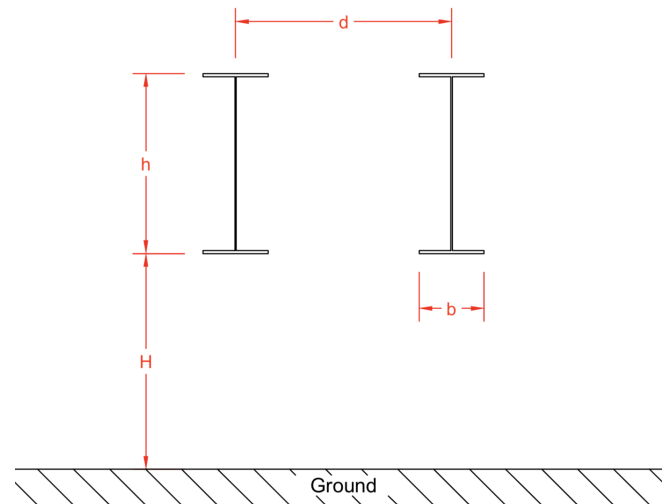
Section's sketch of the bridge before the construction of the slab, including the parameters of the geometry.
